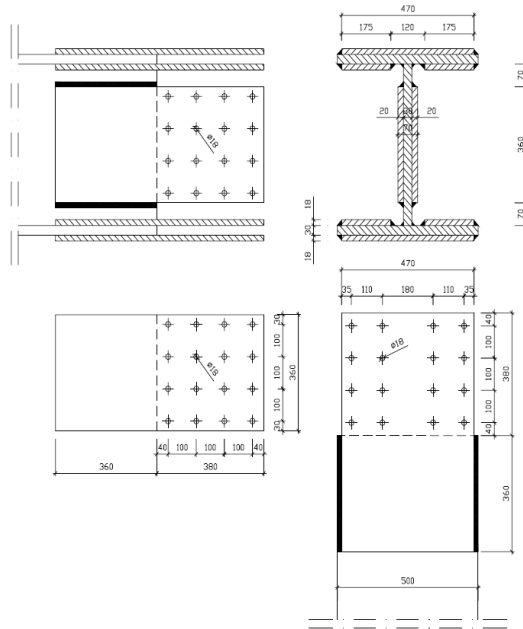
Optimised welded-bolted diagonal connection.
